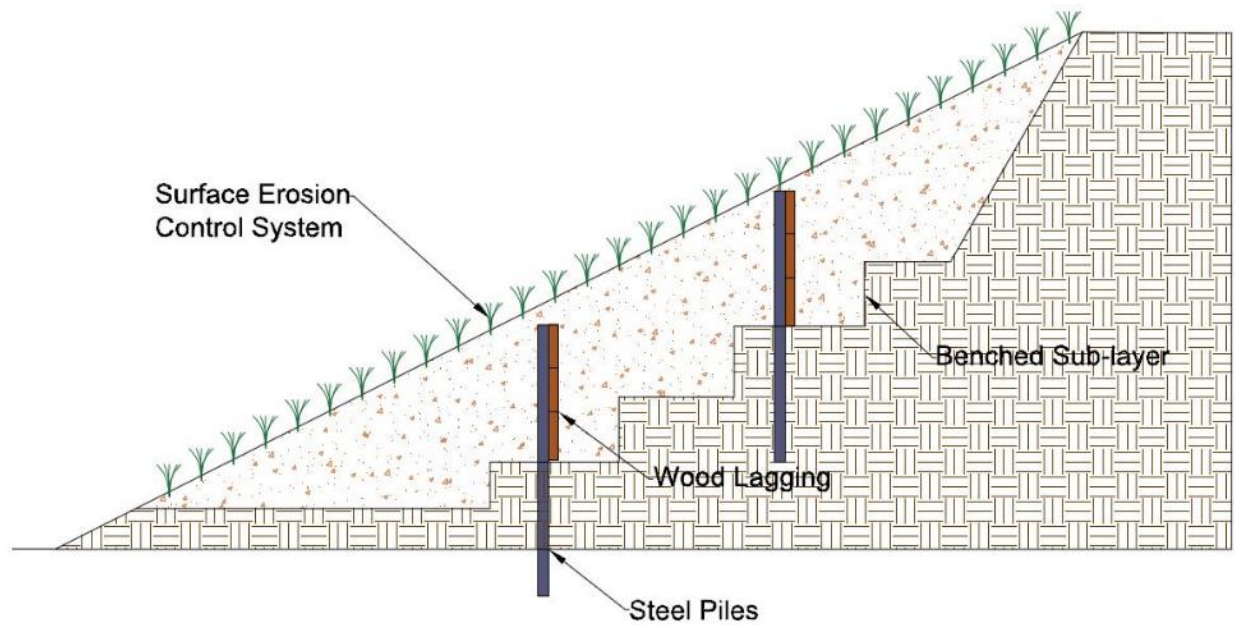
A schematic of soldier piles and wood lagging repair (Adopted from Day (1996))
